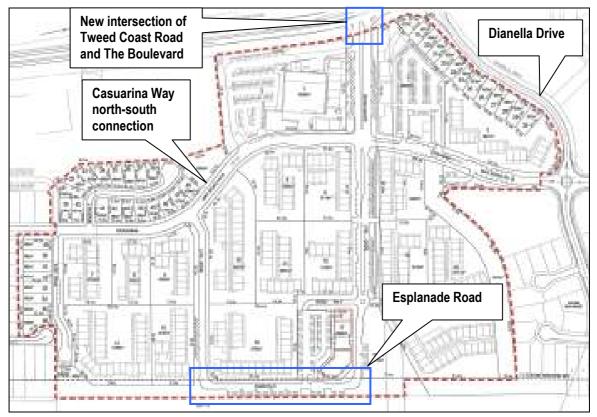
Proposed Town Centre Road Network (source: Preferred Project Report)
